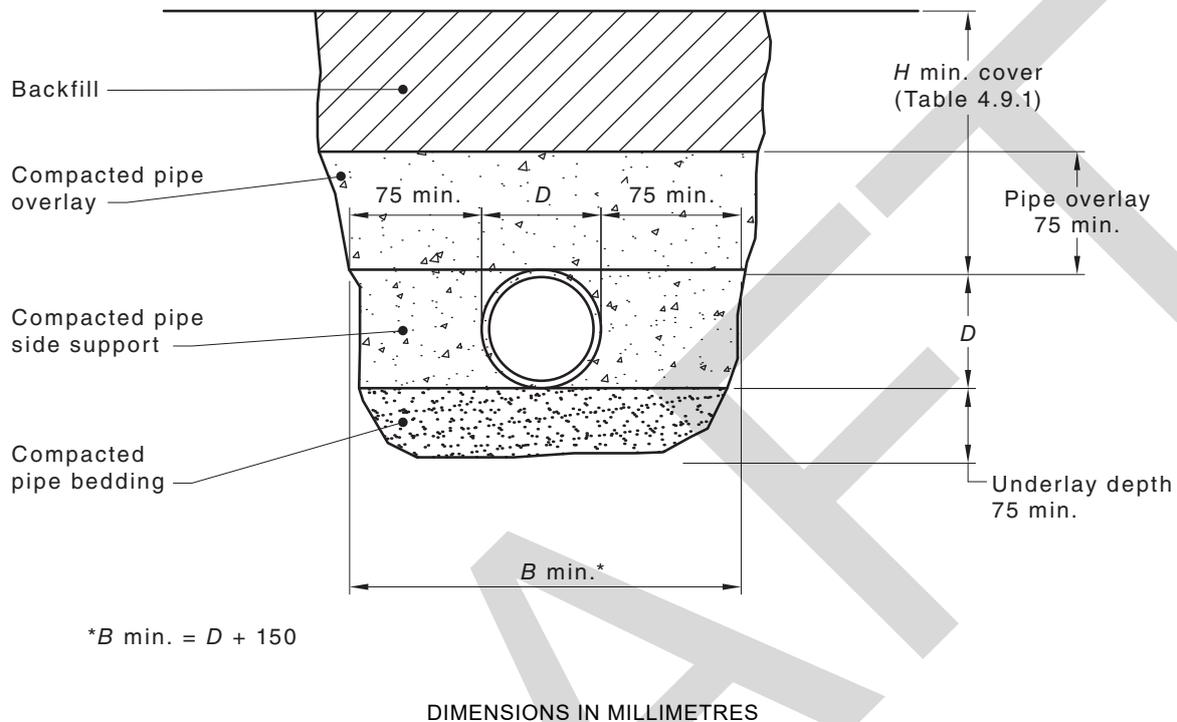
TYPICAL INSTALLATION IN A TRENCH
